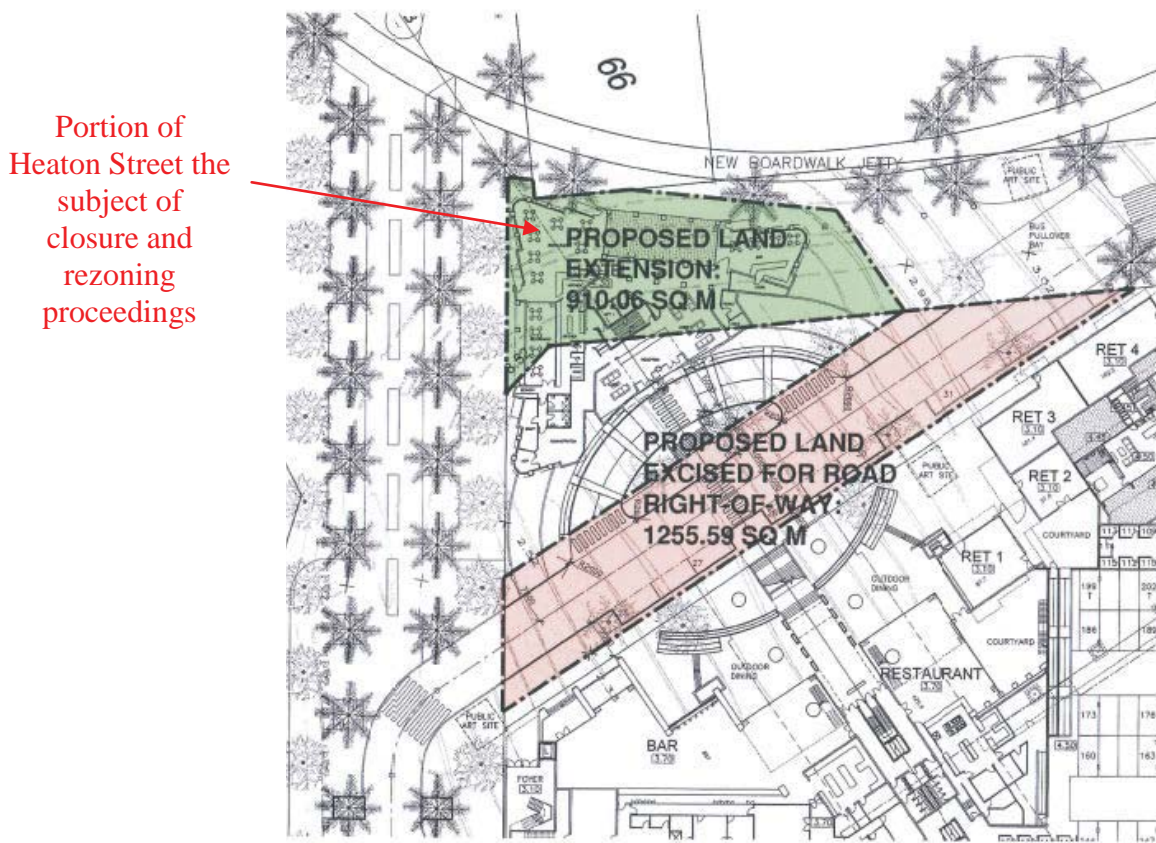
Option 2 Foreshore Plan – Heaton Street Road Reserve
